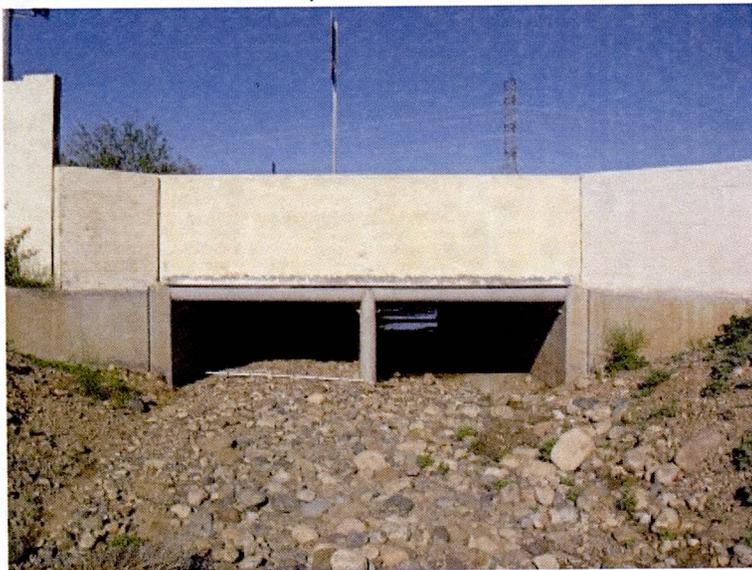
Facing west in channel, southeast corner of the intersection at N. 111th Ave. and W. Beardsley Rd.
